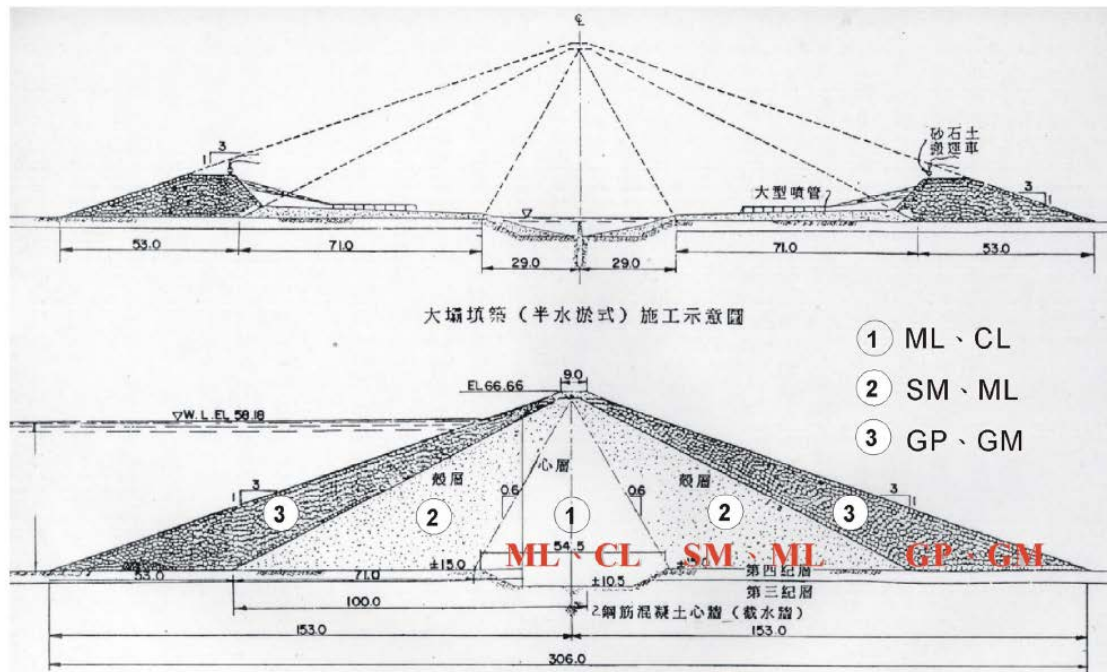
Cross Section of Wu-Shan-Tou Dam.
